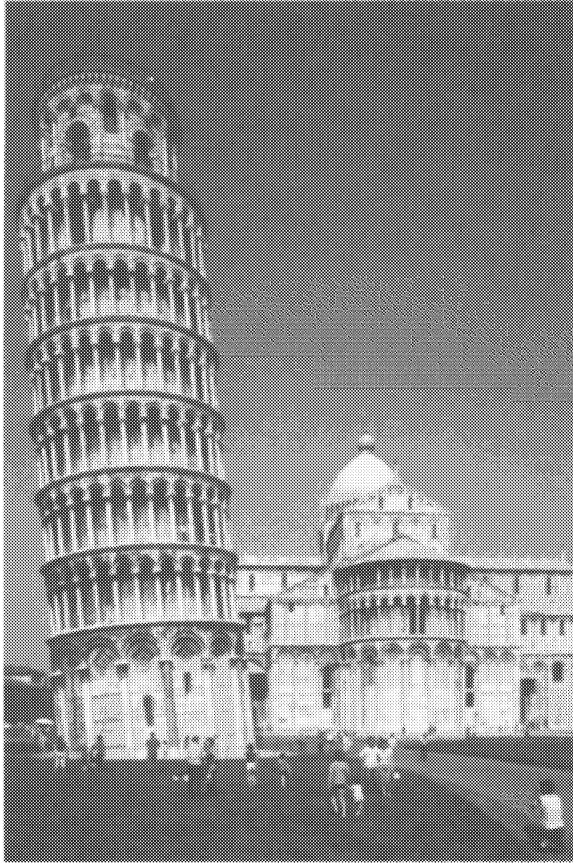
The Leaning Tower of Pisa. An example of differential settlement.
